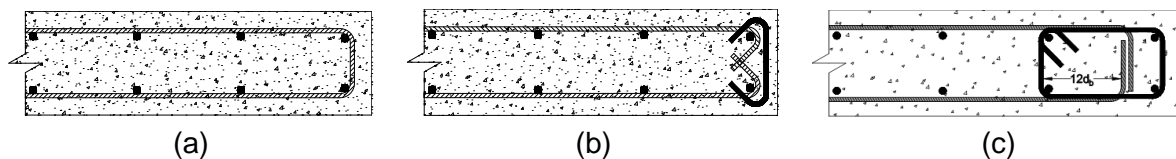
Anchorage of horizontal reinforcement (dimensions exaggerated for illustrative purposes)
